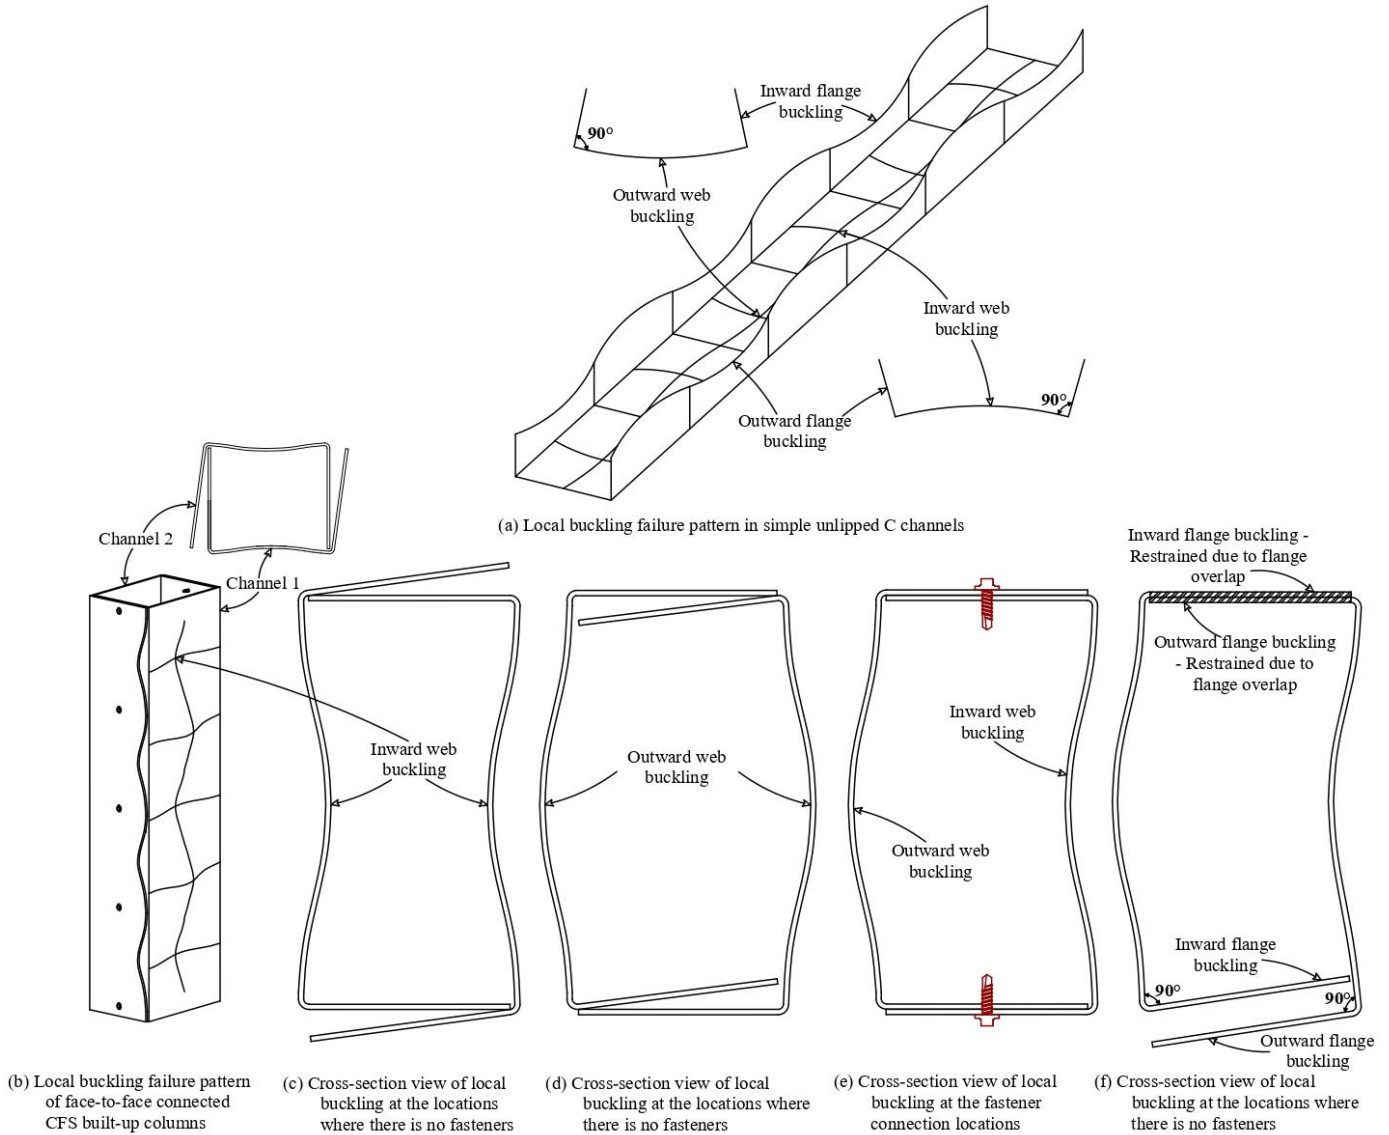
Possible local buckling failure modes in built-up columns and restrained due to the flange overlapping
